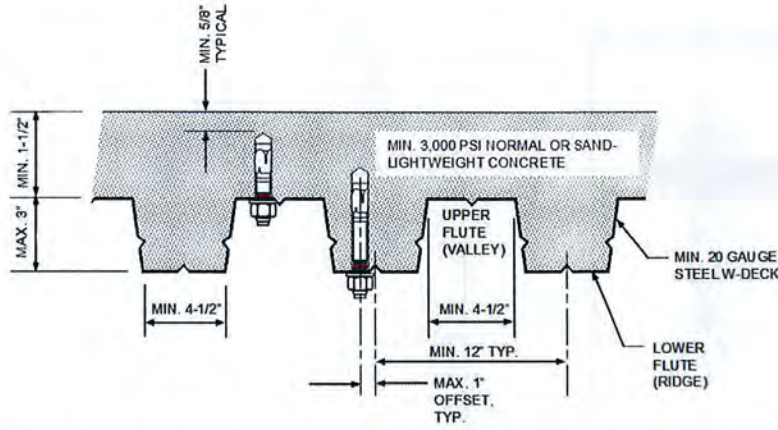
A—INSTALLATION IN THE SOFFIT OF CONCRETE OVER METAL DECK FLOOR AND ROOF ASSEMBLIES¹
